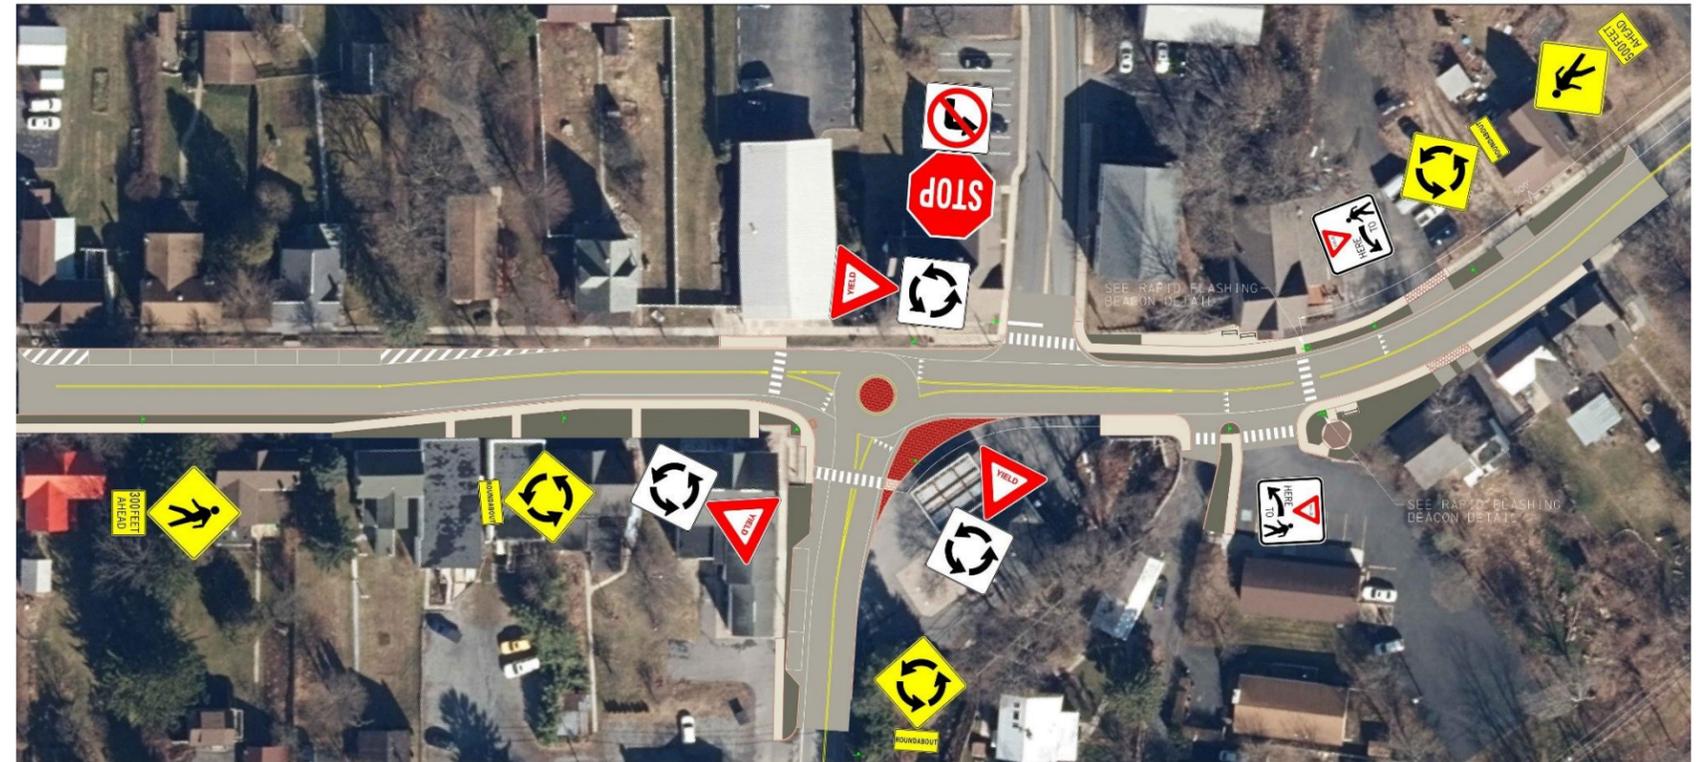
Pine Grove Road & Water Street/Nixon Road – Concept A.2, Small Roundabout Option
